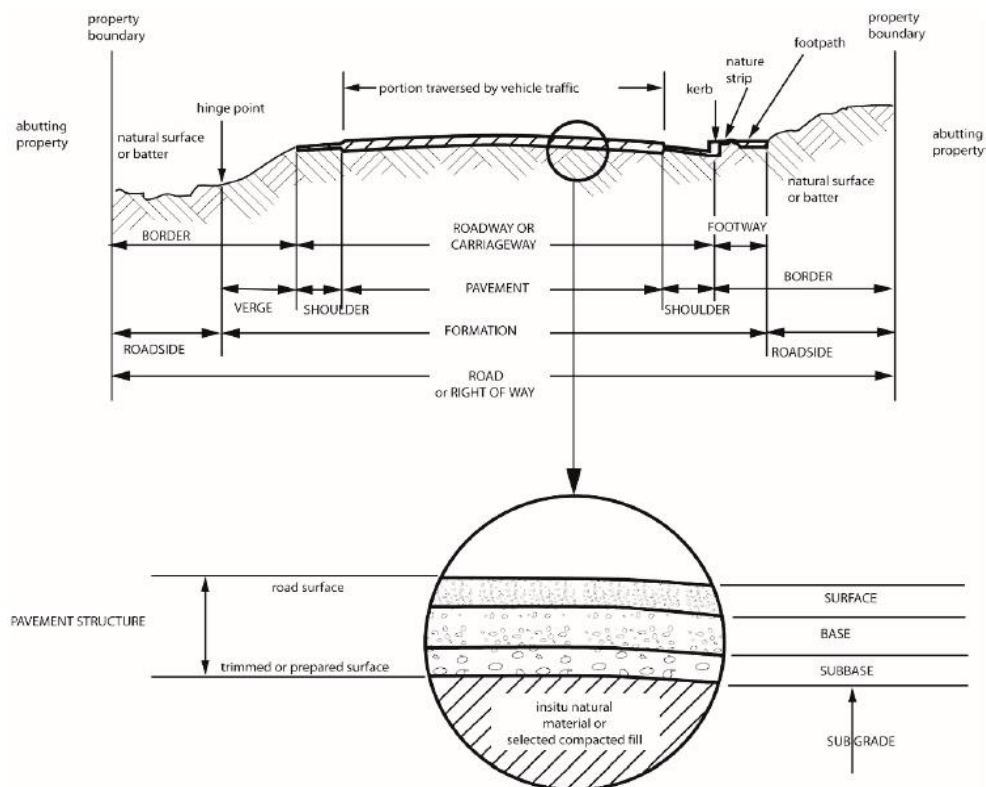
Pavement Structure and its Role in the Road Formation (Austroads 2018a)
